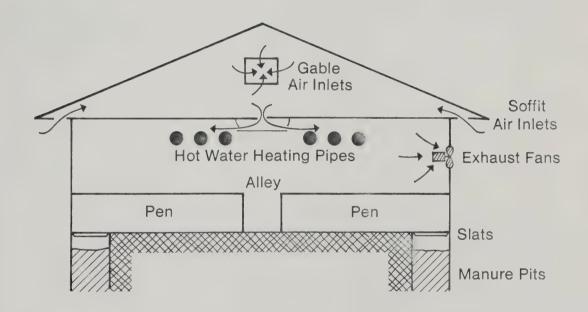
An end-view schematic of barn SL-2 showing some ventilation and structural details.
